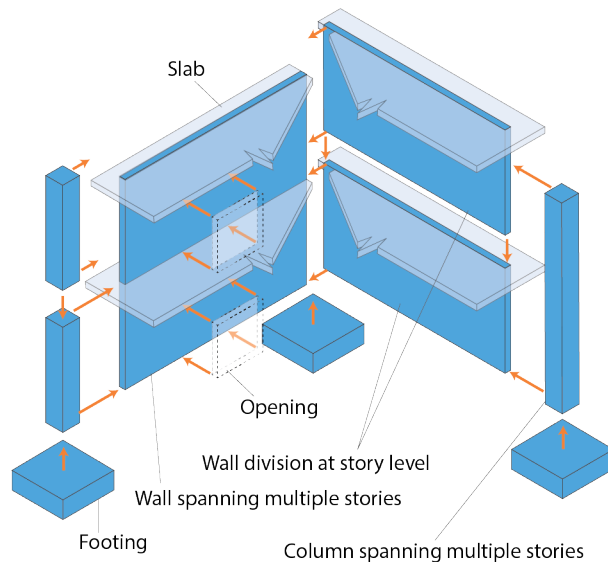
A structural wall system can be modeled in a number of ways in a BIM. Components may or may not be divided at floor levels and can contain openings. For a strength analysis of the wall sections, the wall elements should be divided into pier and spandrel components.
